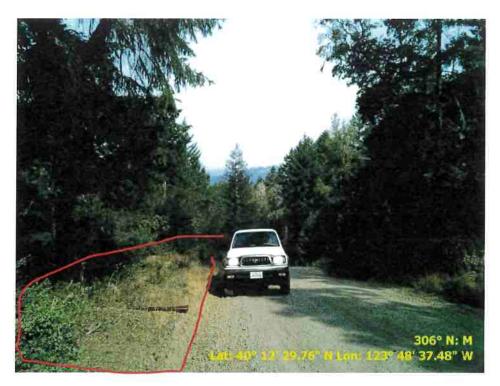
Photo of Road Point 71 showing a pullout that needs to be regraded.
